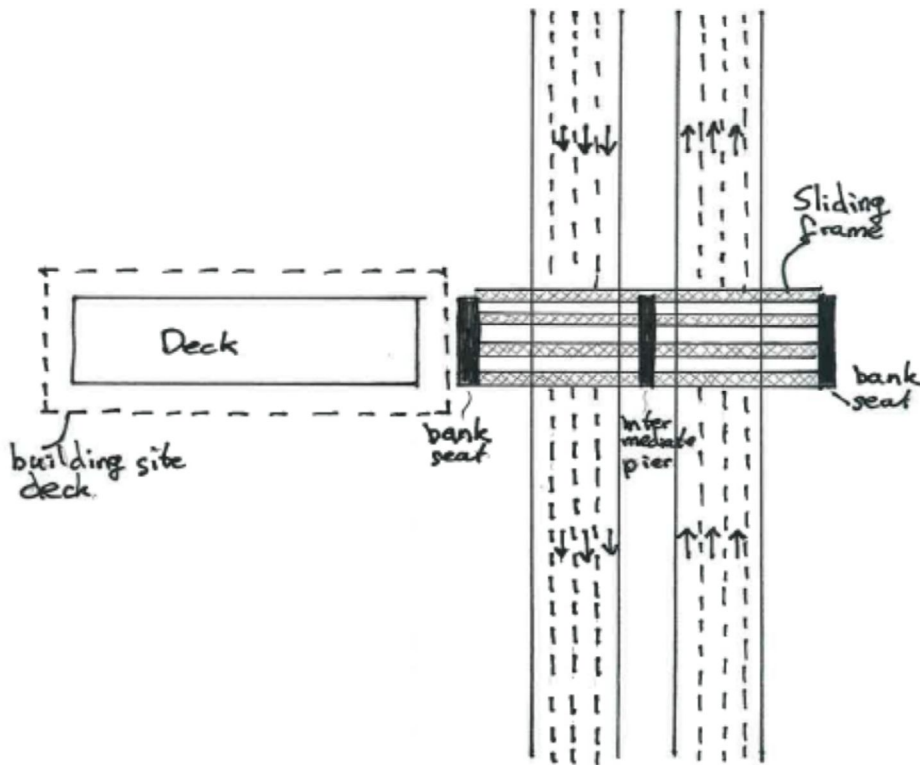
Constructing deck in longitudinal direction and sliding frame over bank seats and intermediate pier
